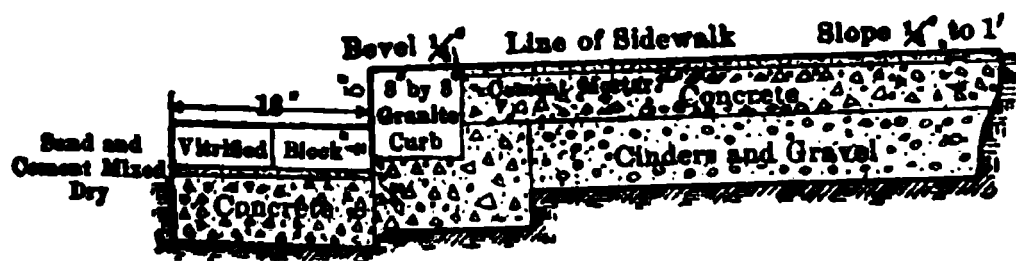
Cement-Concrete Sidewalk, and 8 by 8 in Curb and Brick Gutter on Concrete Base
